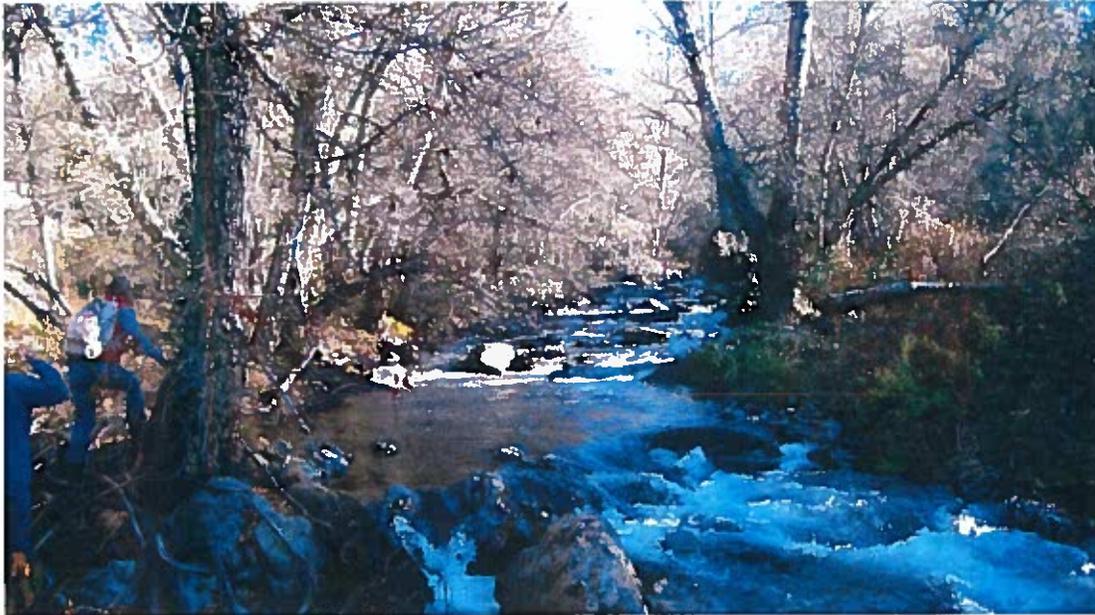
Bridge 5 – Looking Upstream – 12/22/11 Site Visit
